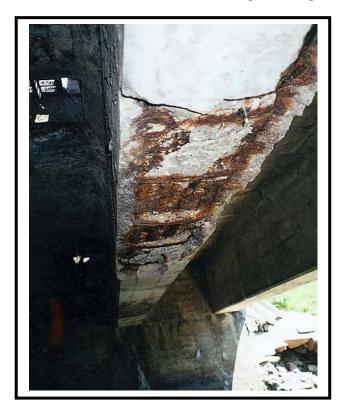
4-98: Reinforced Concrete Girder With Spalling and Steel Section Loss
